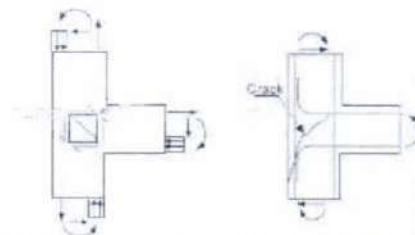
Forces acting at joint (Poor Reinforcement)
